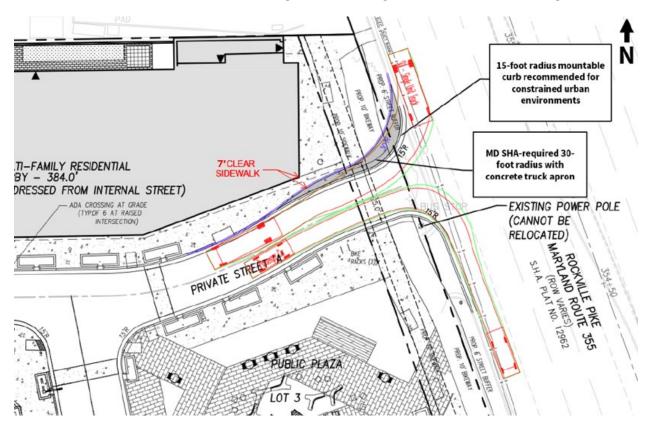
Truck Turning Templates for Private Street A's Rockville Pike Site Access
